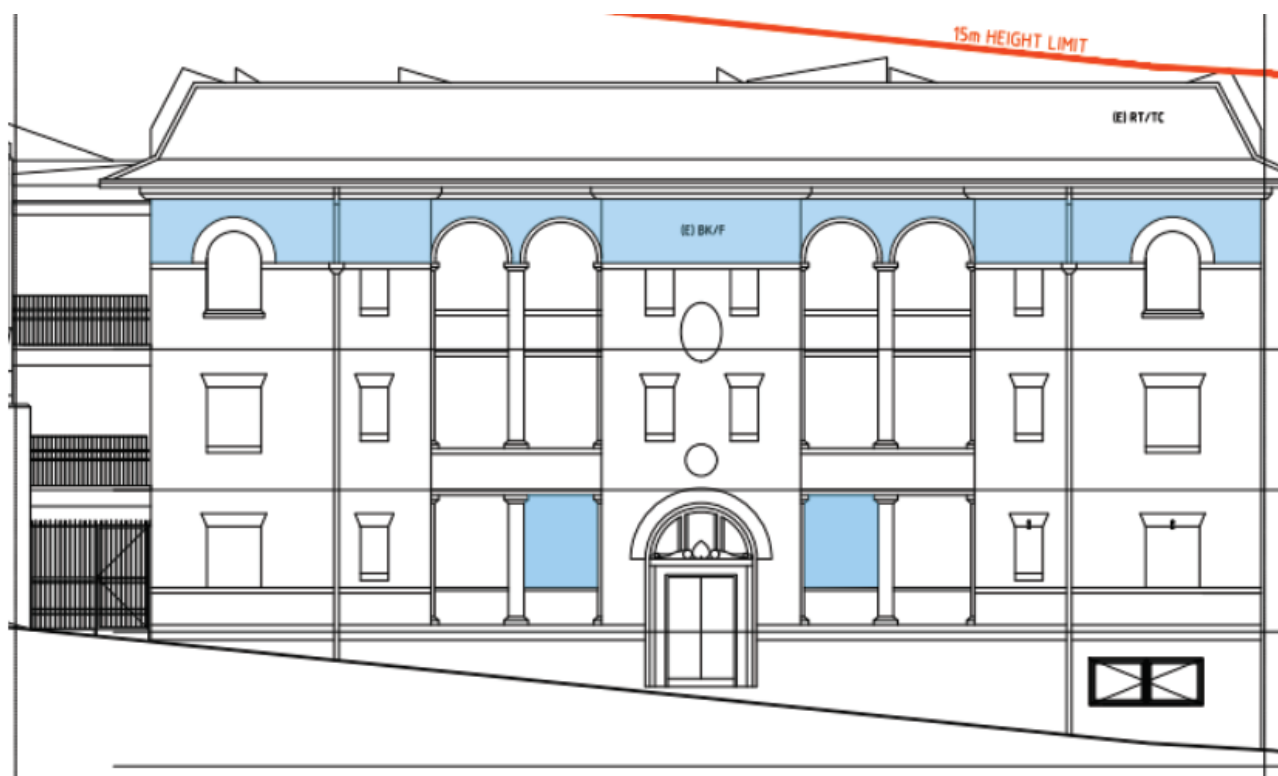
Wilkinson House façade with areas of elements not completed highlighted in blue.
